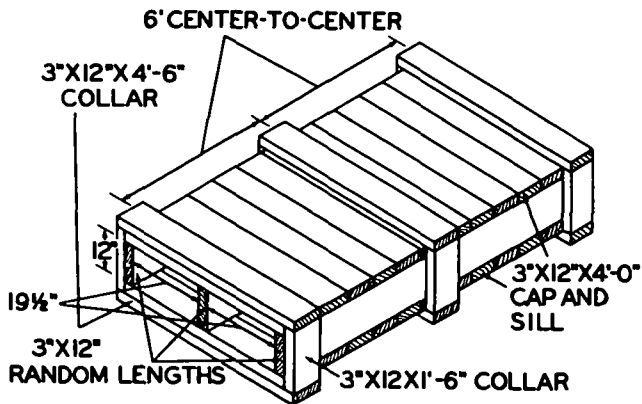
Timber box culvert, 19 1/2- by 12-inch.
